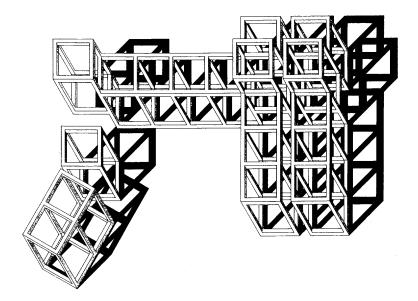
Arata Isozaki: Cubic frame study drawing, Museum of Modern Art, Gunma, Japan, 1971. Plan oblique.
